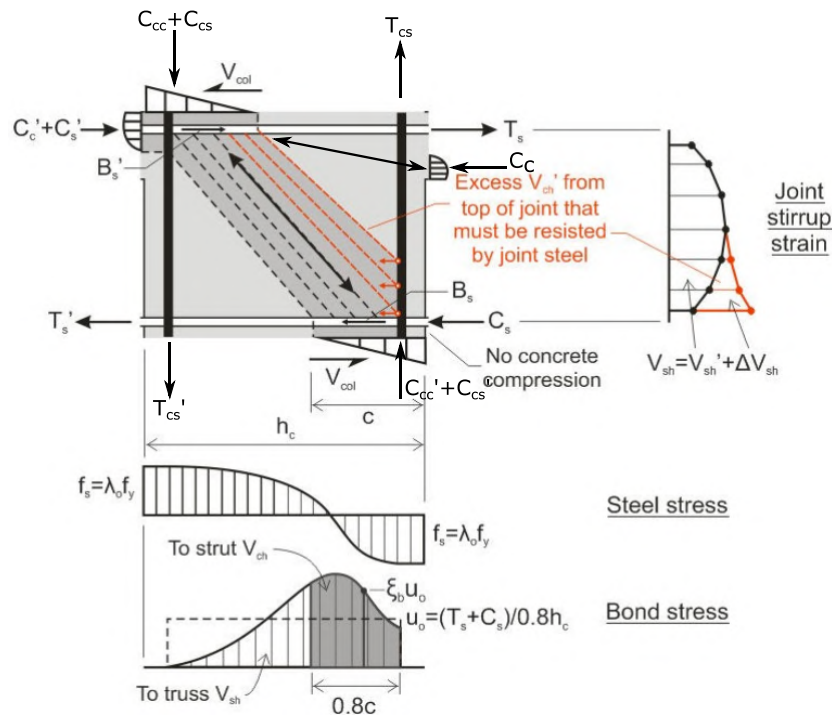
Mechanics for slotted beam interior beam-column joint (Modified after Au, 2010).
